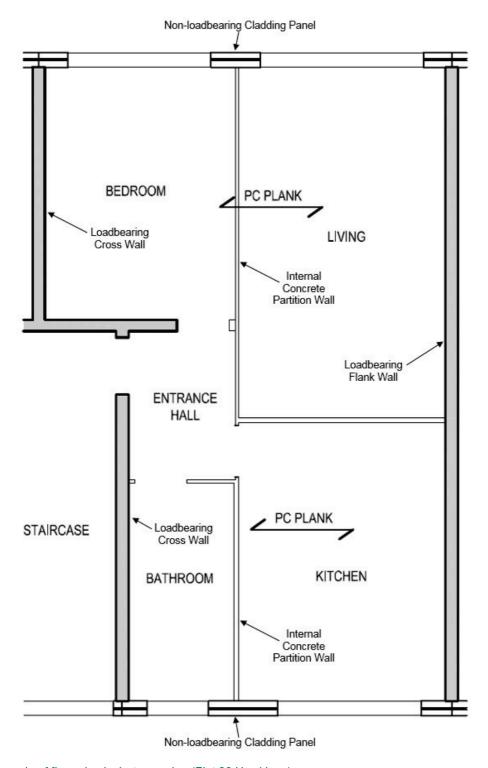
Example of floor plan in 4-storey wing (Flat 36 Hawkinge)
